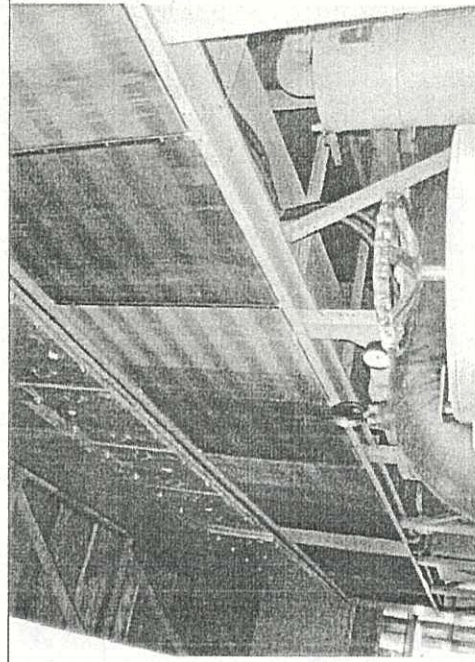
Noise Acoustic Panel installed on Ceiling in SIH Chiller Plant Room
